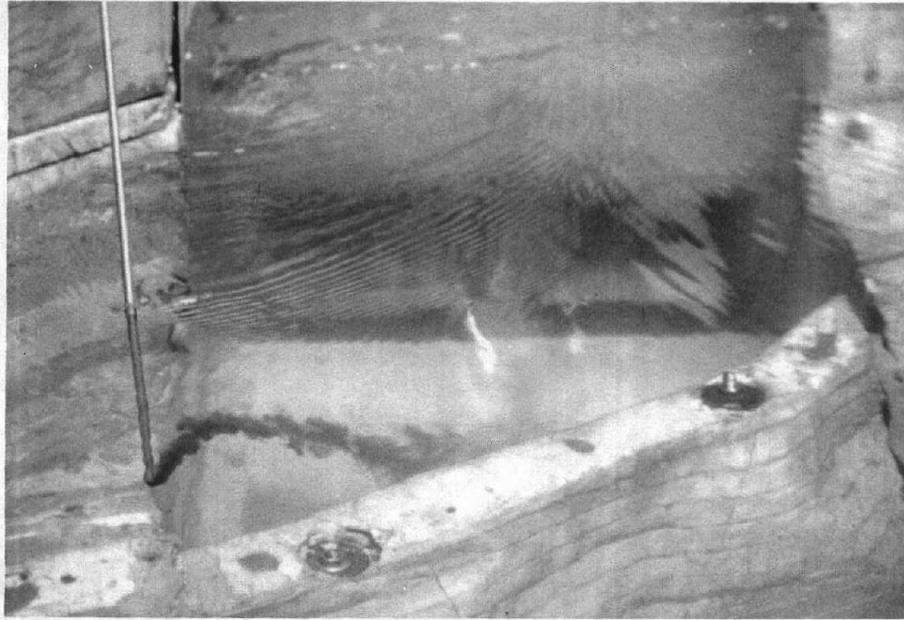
Gate chamber approach channel with existing side channel weir at elevation 5360.0.
